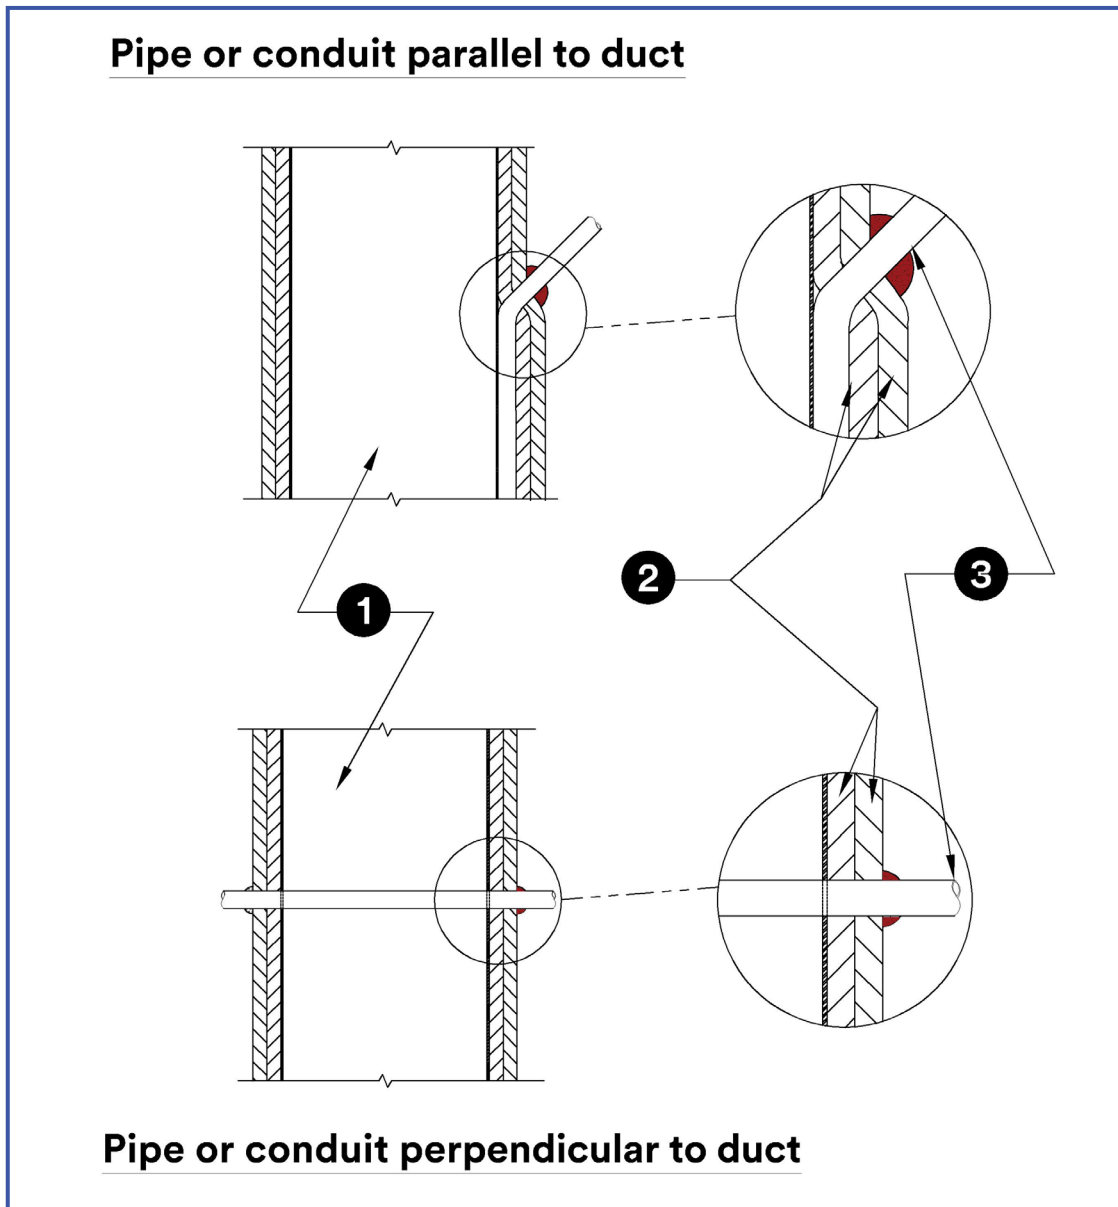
Conduit penetrations of wrap envelope for ventilation duct systems
